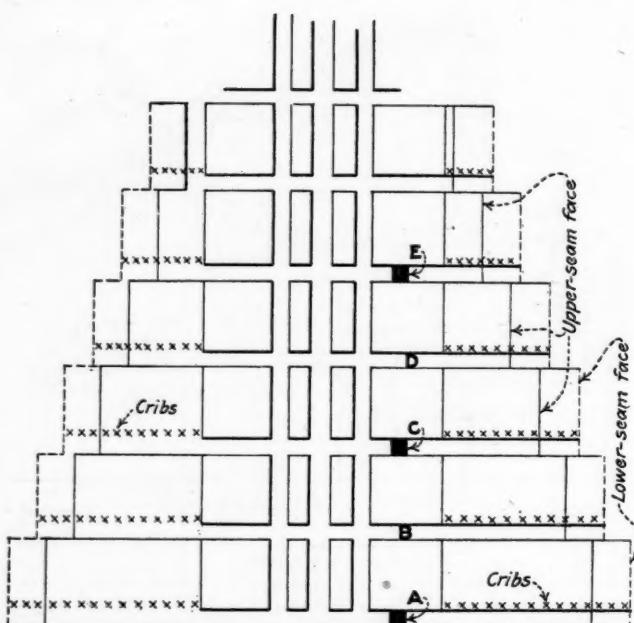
LONGWALL WORKINGS IN BOTH SEAMS
